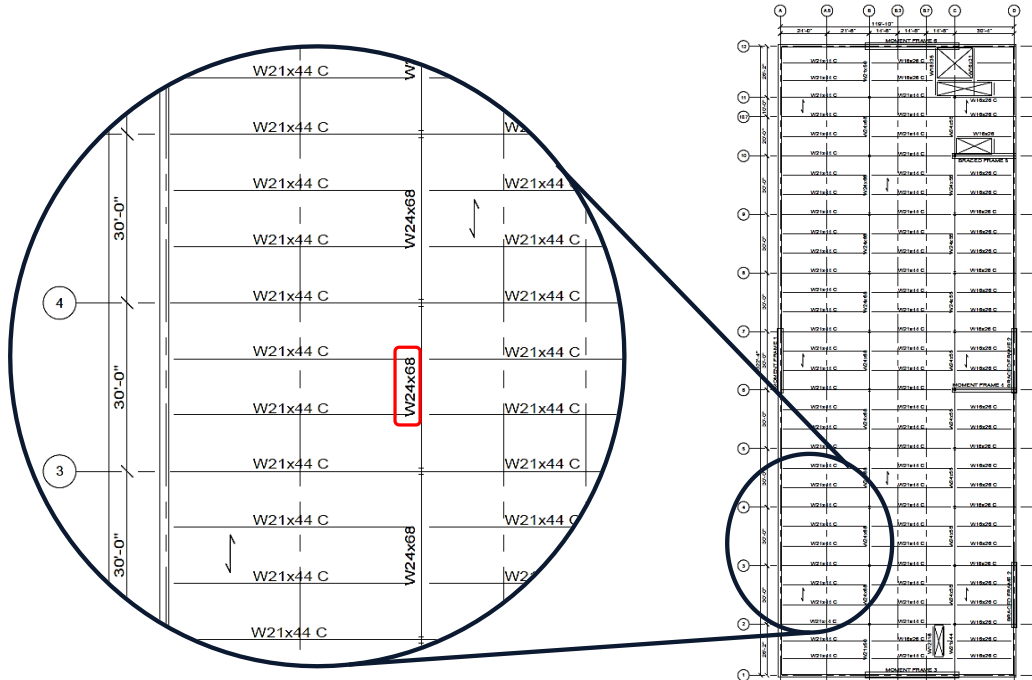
Girder Selected from Office Benchmark Building (AISC, 2018)
